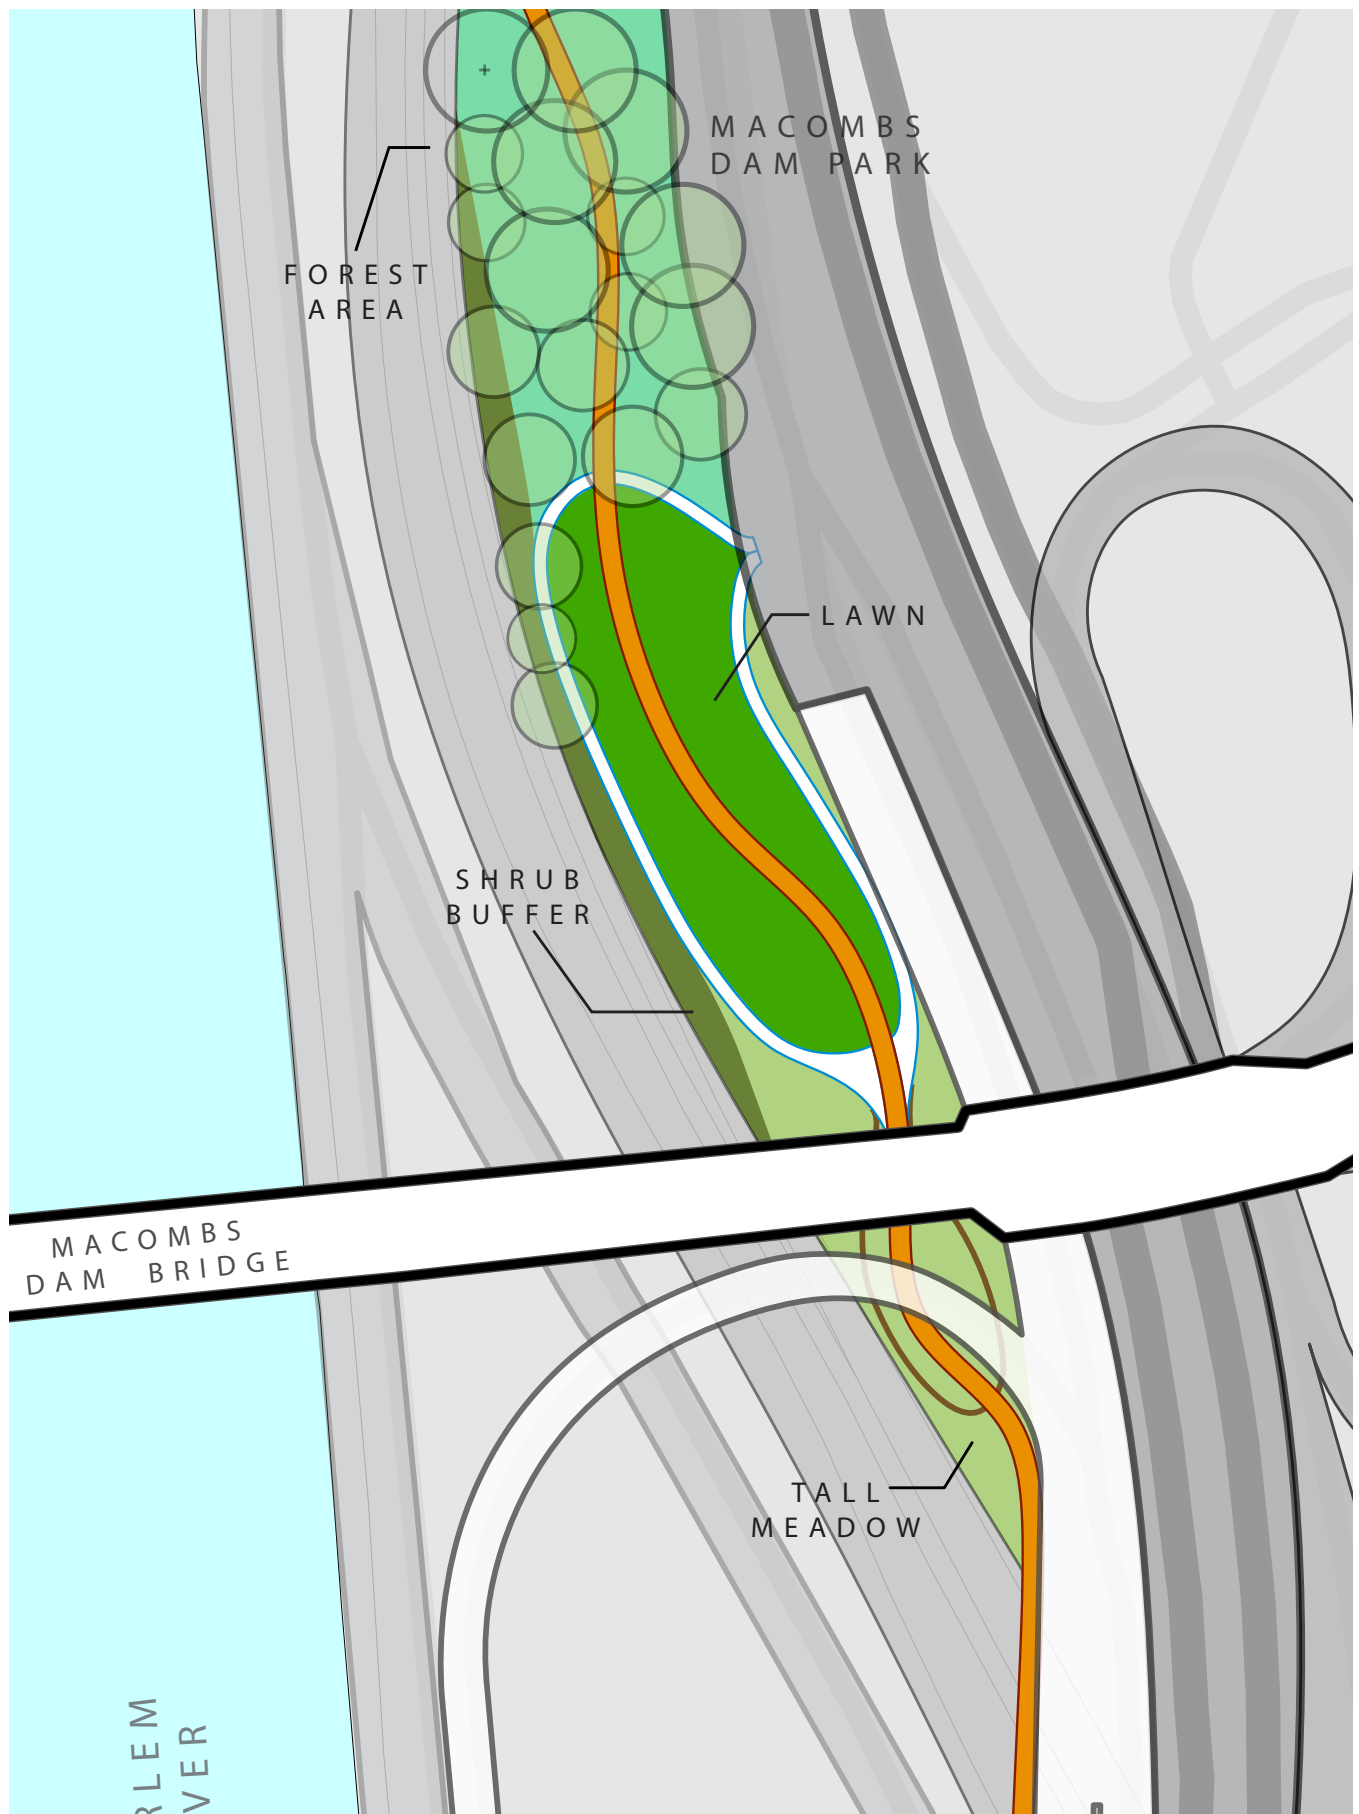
Concept Plan: Proposed Greenway at Macombs Dam
